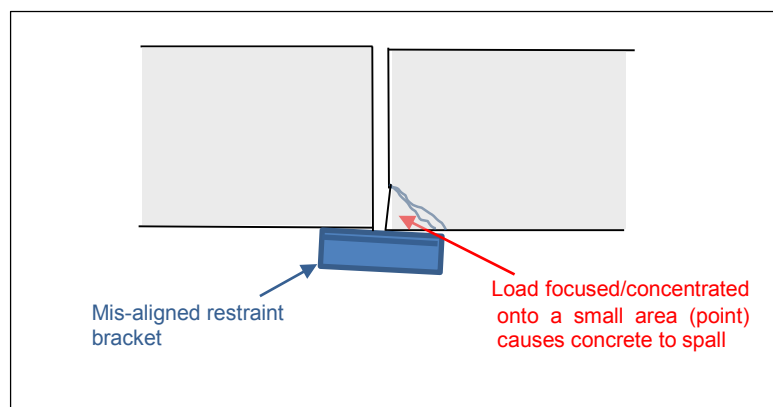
Diagram (Sectional Plan View) showing how spalling can occur
